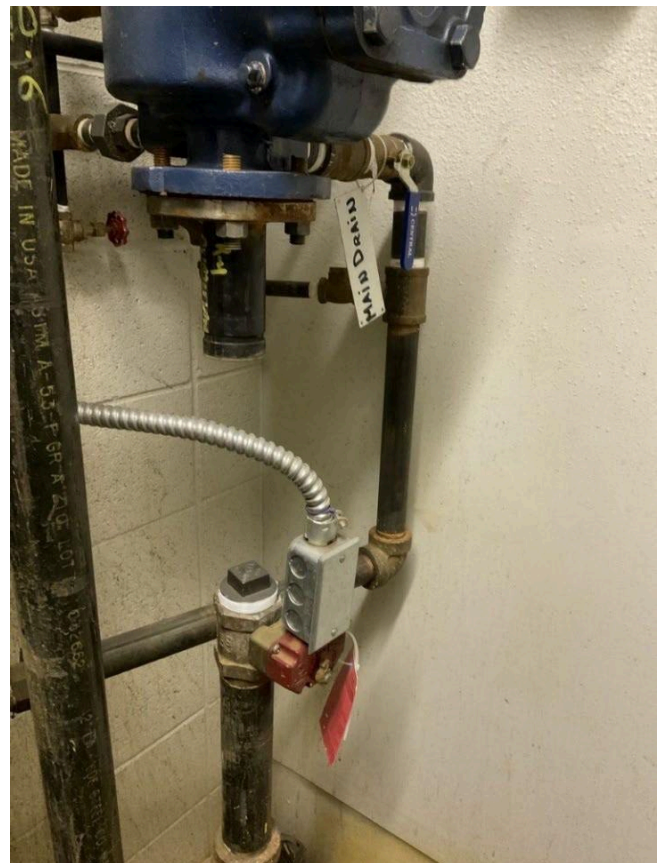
MISSING FIRE SPRINKLER PIPING
